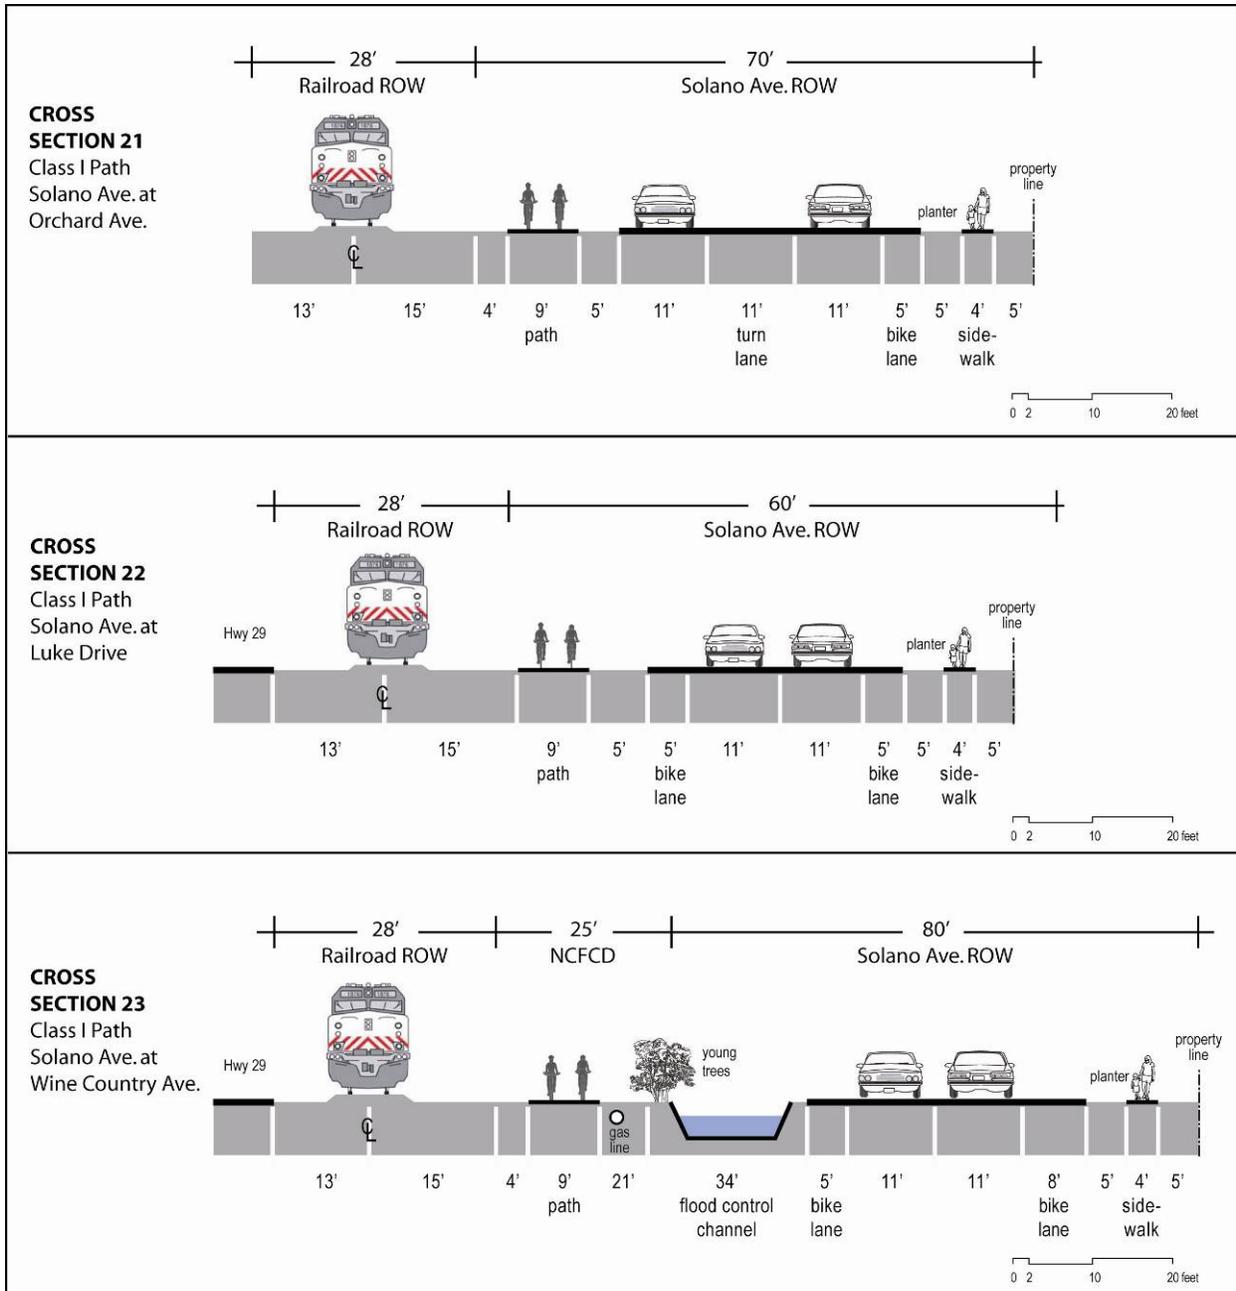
Napa Valley Greenway Typical Cross Sections
